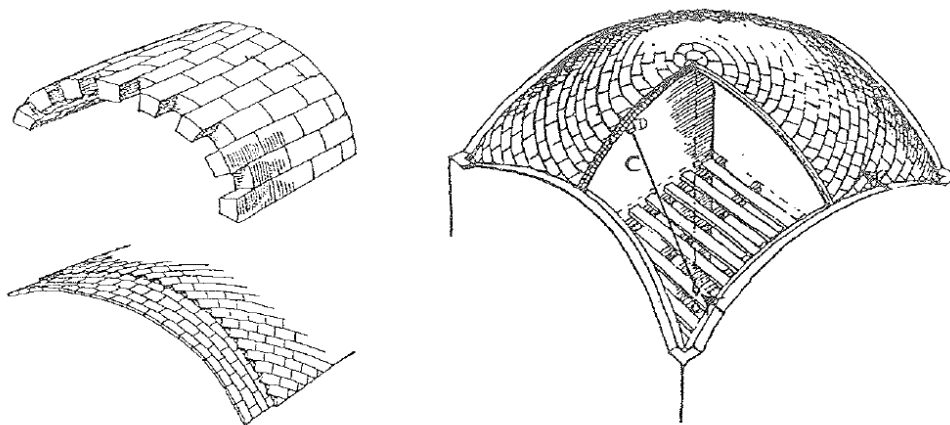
Construction of timbrel vaults (left) comparison between a timbrel vault and a stone voussoir vault; (right) construction without centering of a timbrel dome (Moya, 1957)
